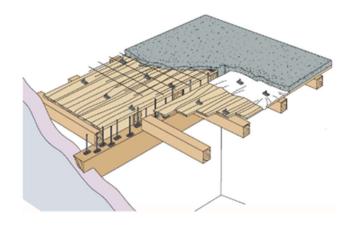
The reducing wooden ceilings weight with a cooperating reinforced concrete slab (Meireles et al., 2013)
